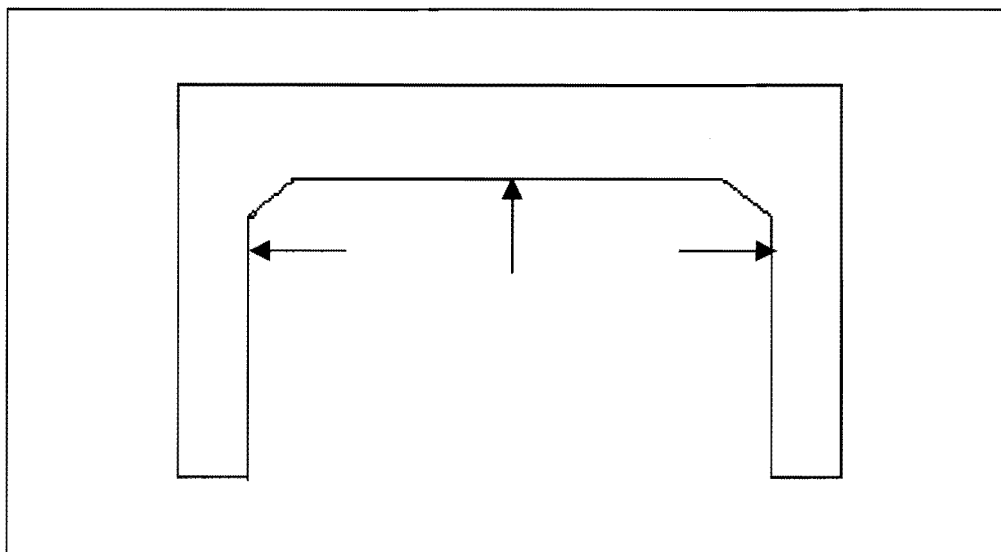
Positions along the culvert width, indicated by arrows, at which the cover to steel was checked.
